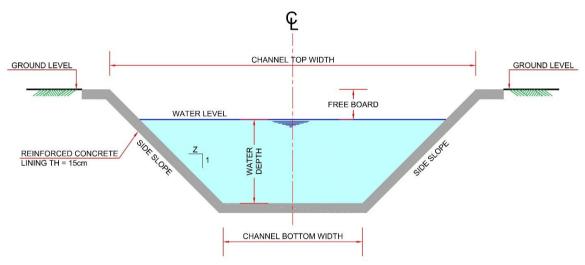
Typical Cross-Section for a Concrete Lined Channel (Bed and Sides)
